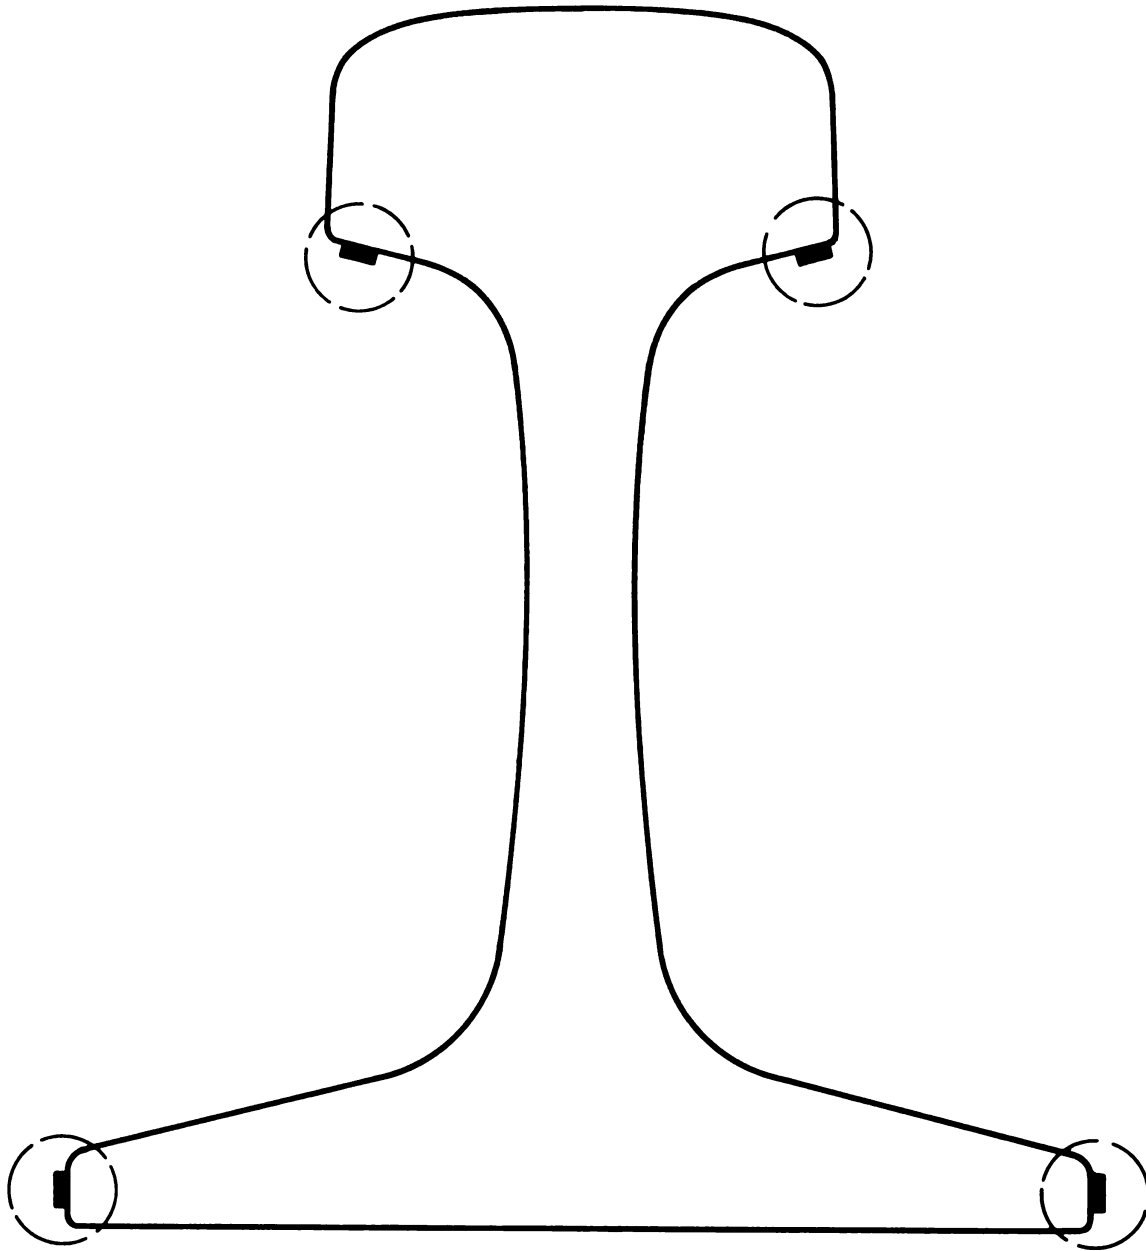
RAIL FASTENER BOLT LOAD MEASUREMENT
